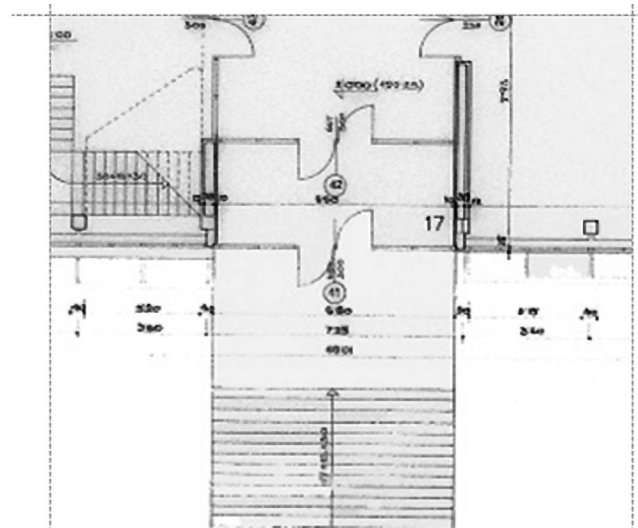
Original Albini's ground floor plan of Small Building. The drawing shows the position of the wind-protection door which was removed in the 2008 reconstruction of the building. Source: Faculty of Food Technology and Biotechnology, University of Zagreb
